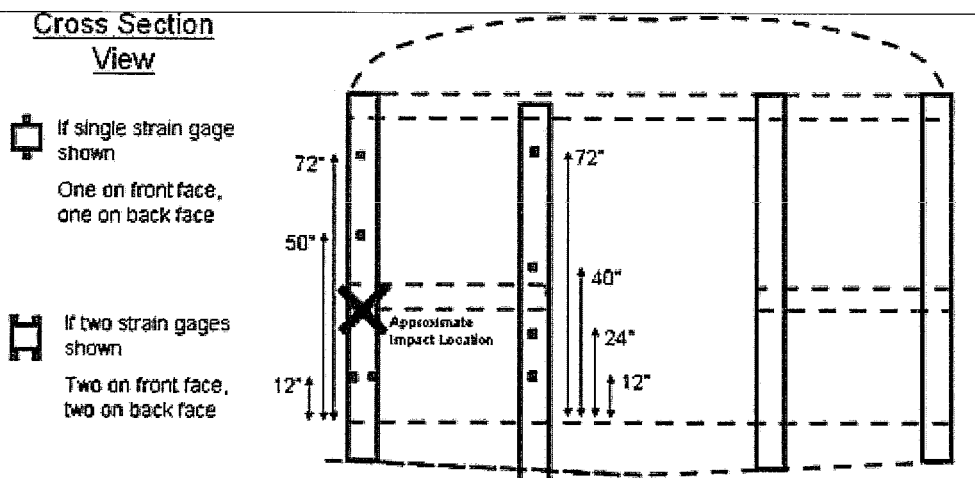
Vertical Member Strain Gage Locations, End Post Test
